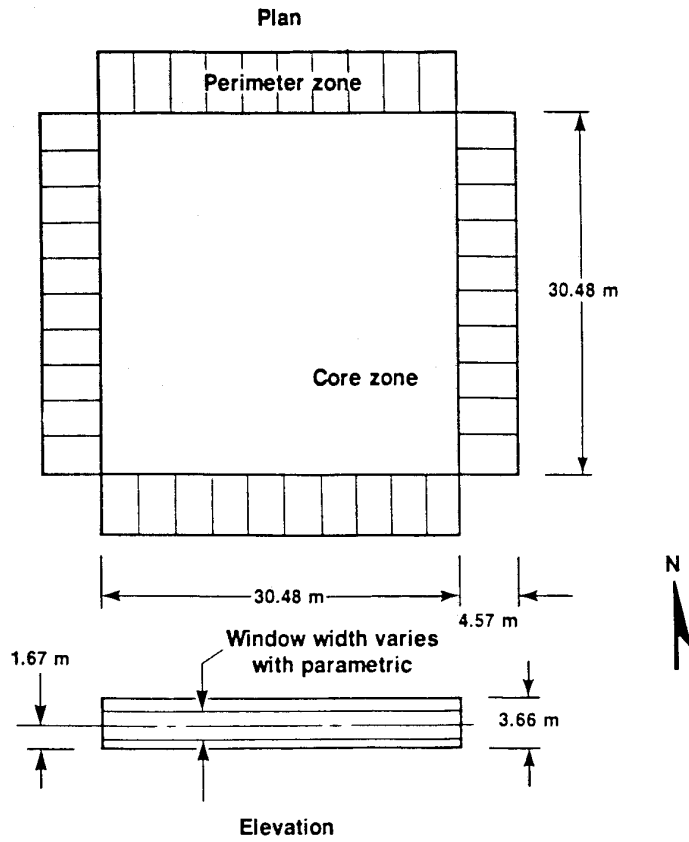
Plan of simulated office building showing alternative window-to-wall ratios. Module consists of a 929m² core surrounded by 4.57m deep perimeter zones, each divided into 10 modules 3.05m wide.
